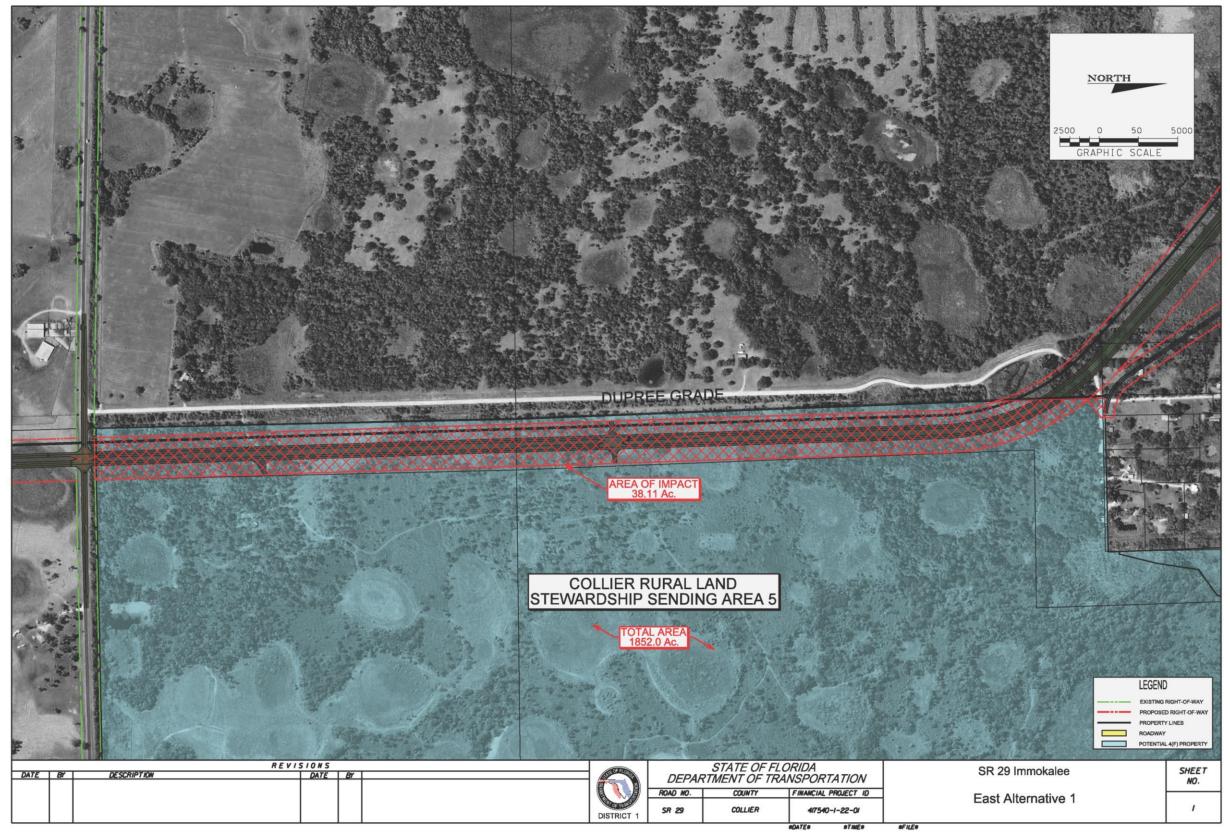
EAST ALTERNATIVE #1 POTENTIAL IMPACT TO SSA #5
